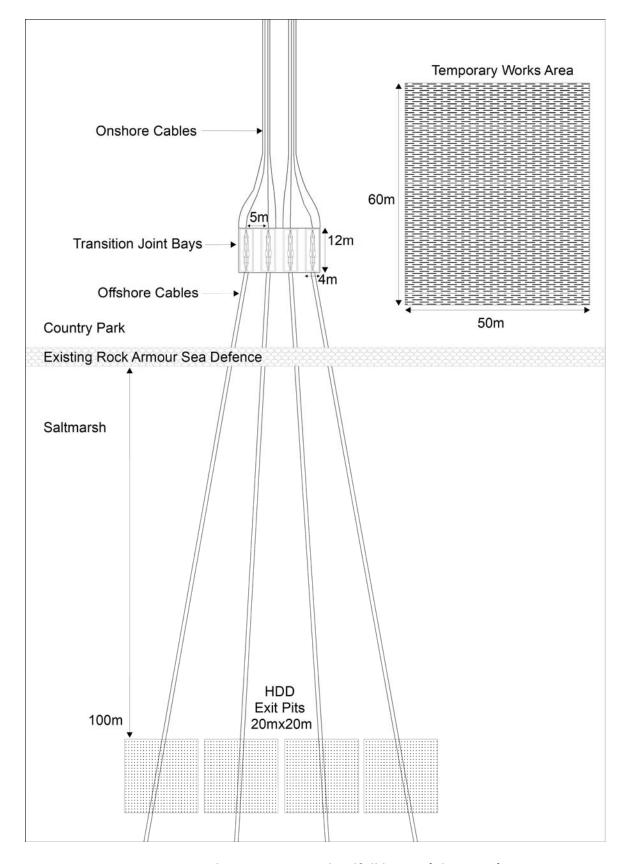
Indicative Option 1 landfall layout (plan view).
